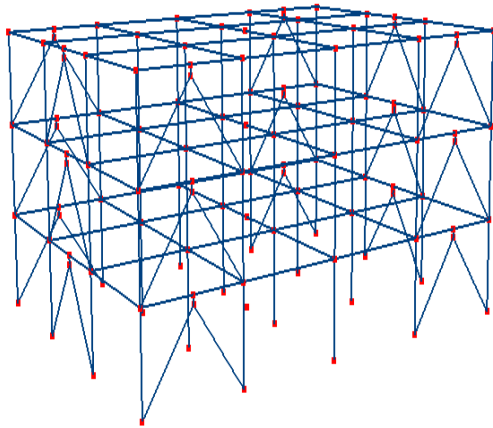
Elevation of the 3-story structure strengthened by eccentric bracing.
